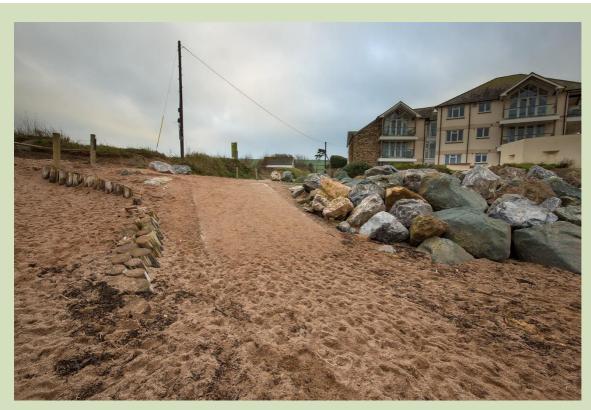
Slipway (National Trust) and rock revetment (not National Trust) (source: Robert Harvey)
